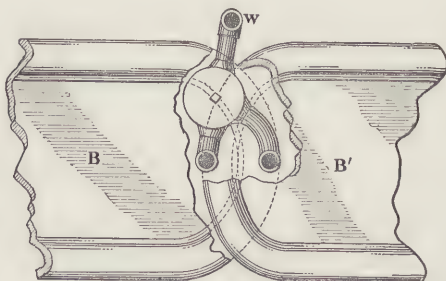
PLAN OF DRUM TRAP SETTING—COVER ACCESSIBLE WITHOUT BEING TOO PROMINENT
